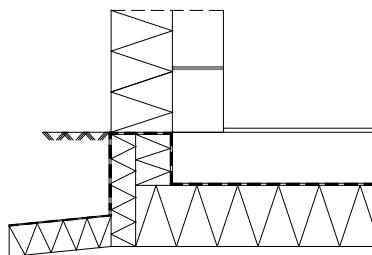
A fragment of a foundation slab joined with an external wall (Source: own elaboration)
